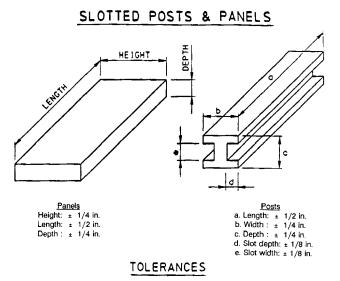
Details of tolerances for concrete post and panel noise barriers in Pennsylvania.
